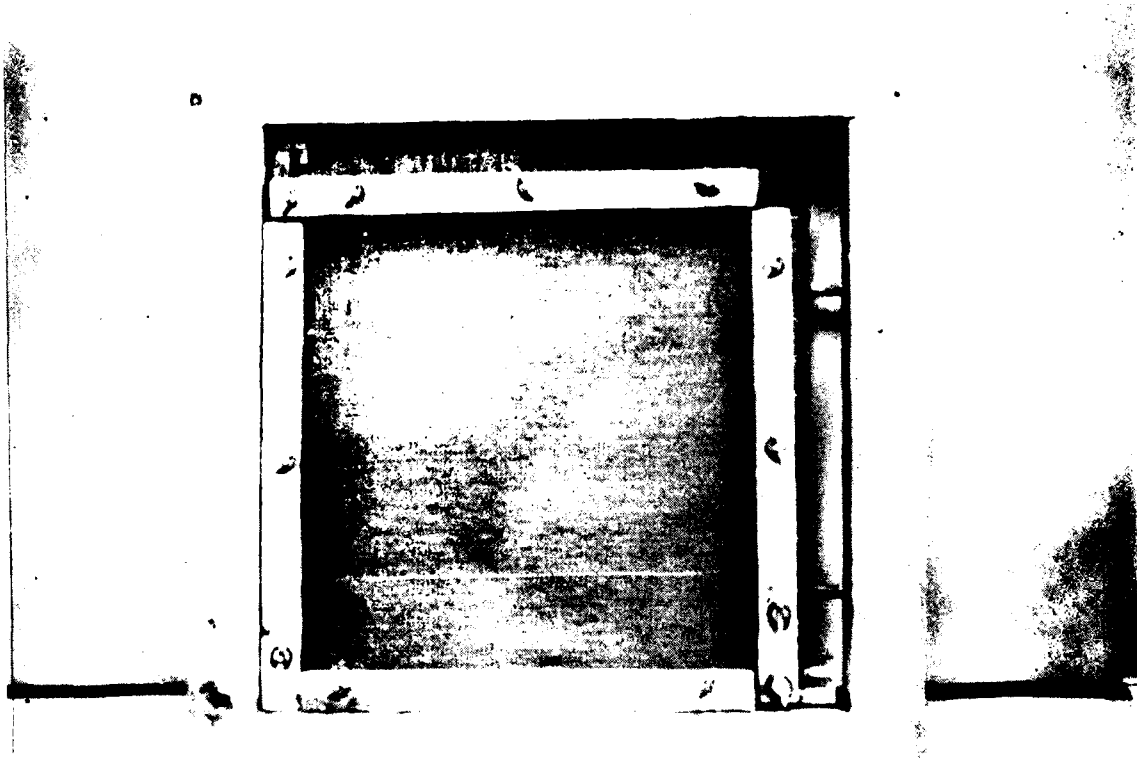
Photograph of Fabric Anchorage Frame, with Fabric Installed, Used in Soil Reinforcement Experiment
